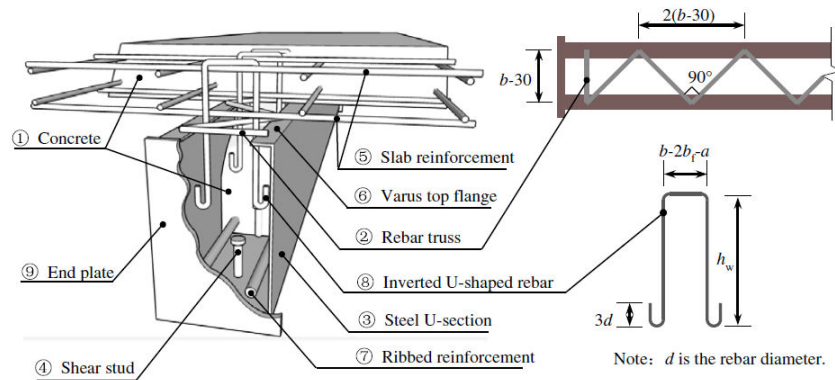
New RCUCB beam details (Liu et al., 2019)
